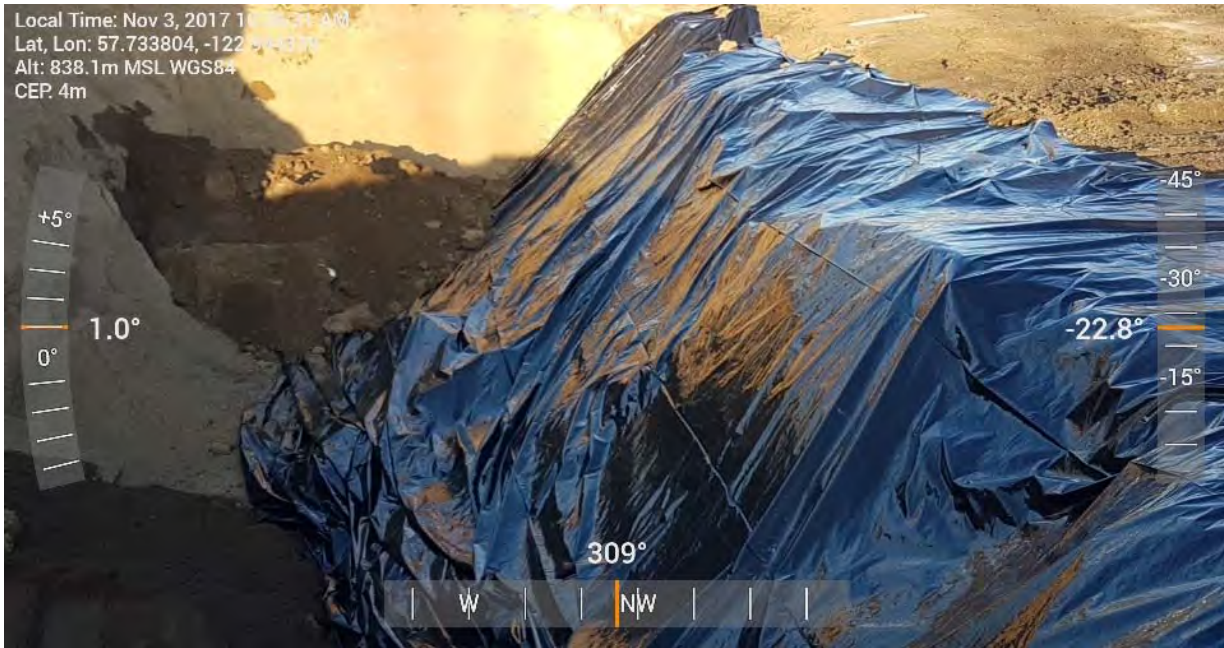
Installation of poly liner along northern wall of AEC 1B looking towards the north-west.
